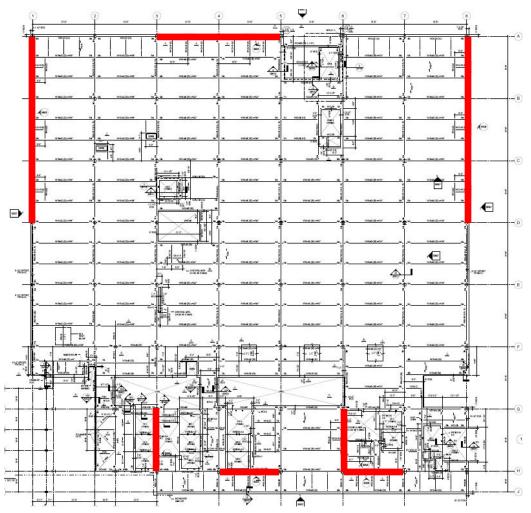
Figure B – Level Two Framing Plan with Braced Frames Highlighted
